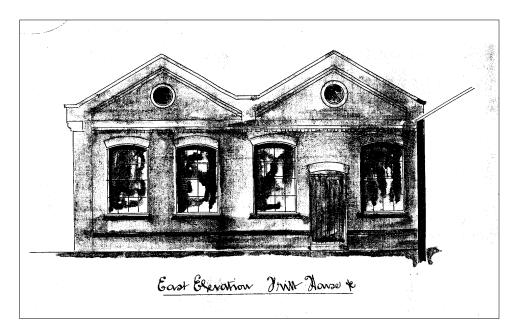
East elevation of the 1889 adopted proposal for the replacement of the Frit Kiln, Mixing House, Stores and Plaster House (Figure 1)¹⁶
